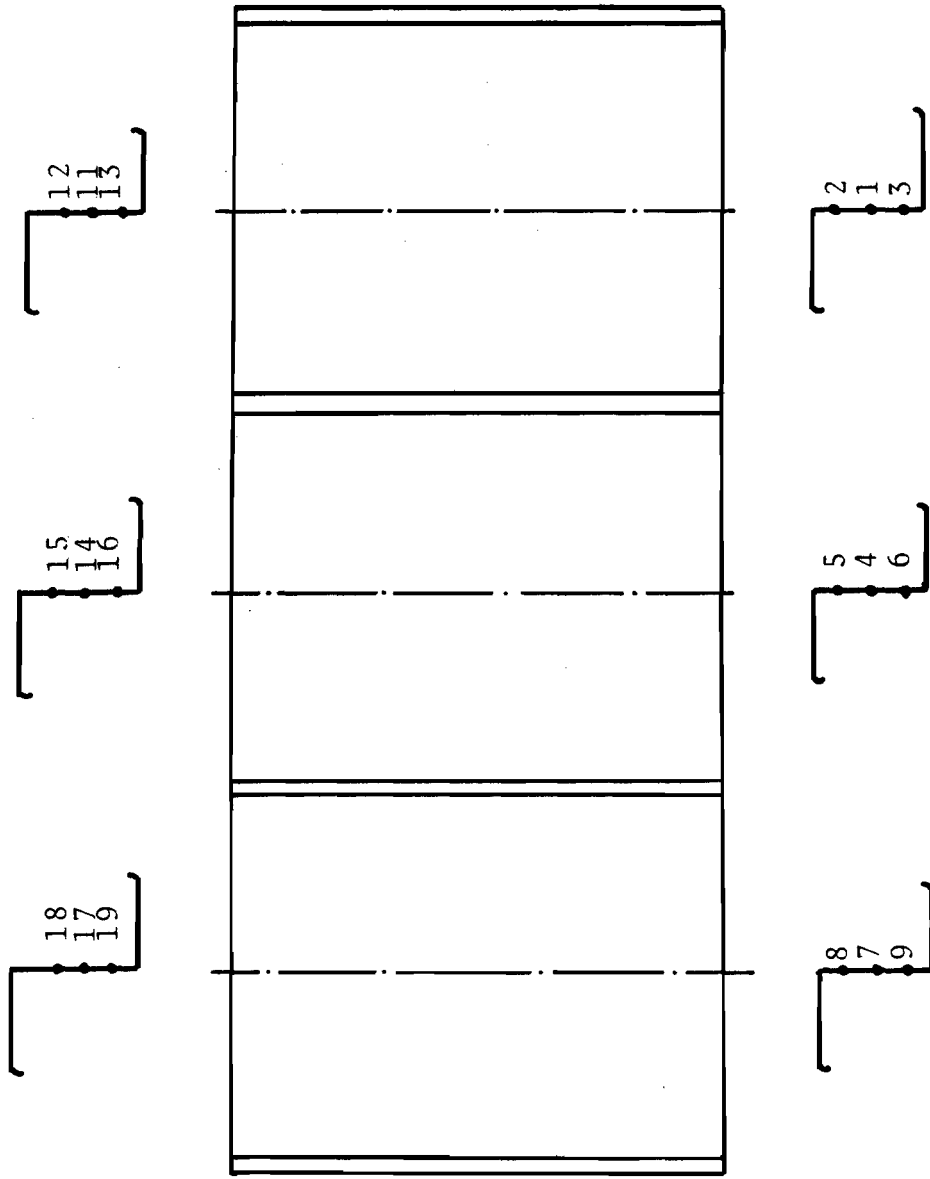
Dial Gage Locations - Second Z-Section Purlin Test
